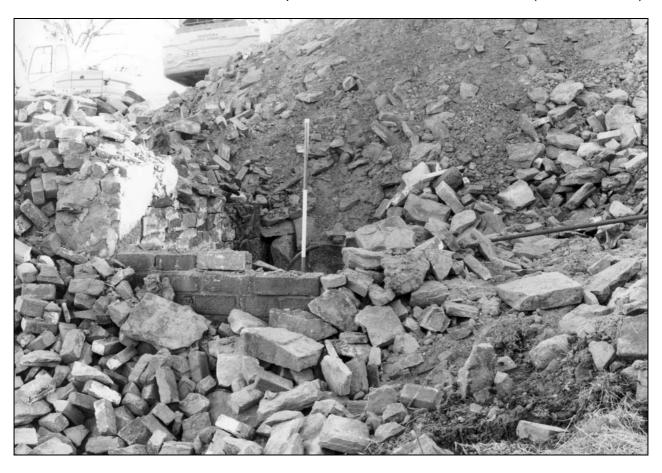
Wheelpit, as visible at start of watching brief, looking east (film 1, frame 18)
